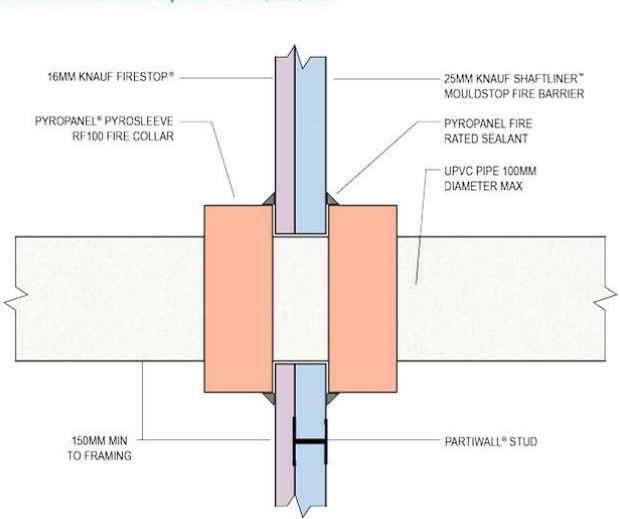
Back to Back Wall Penetrations – Plan Details – FRL 60/60/60
